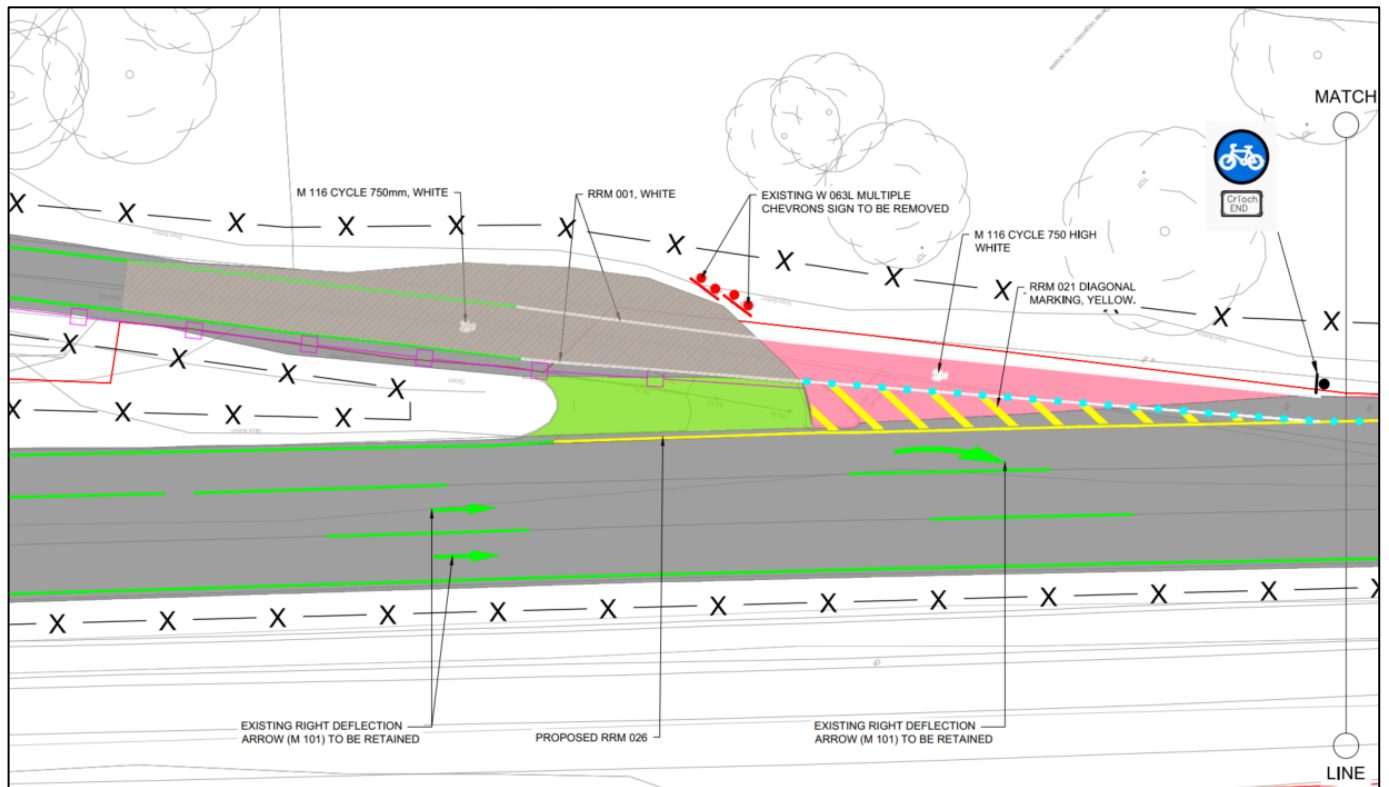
Road markings and signage at Drummin Lane – Exist of N11
